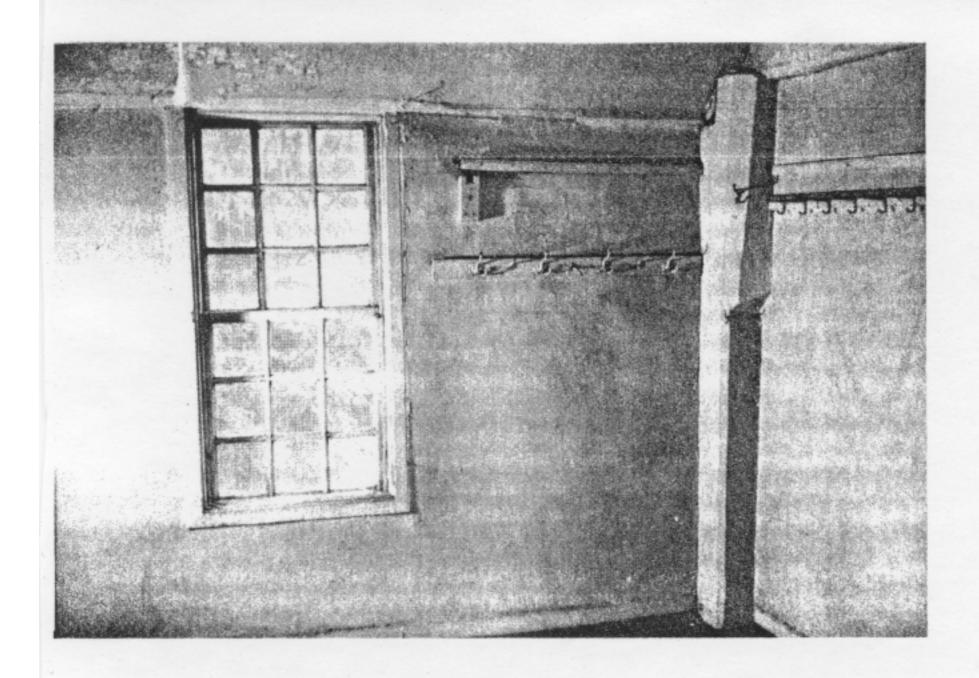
Narbonne House, Interior view of north-west corner, second floor.
